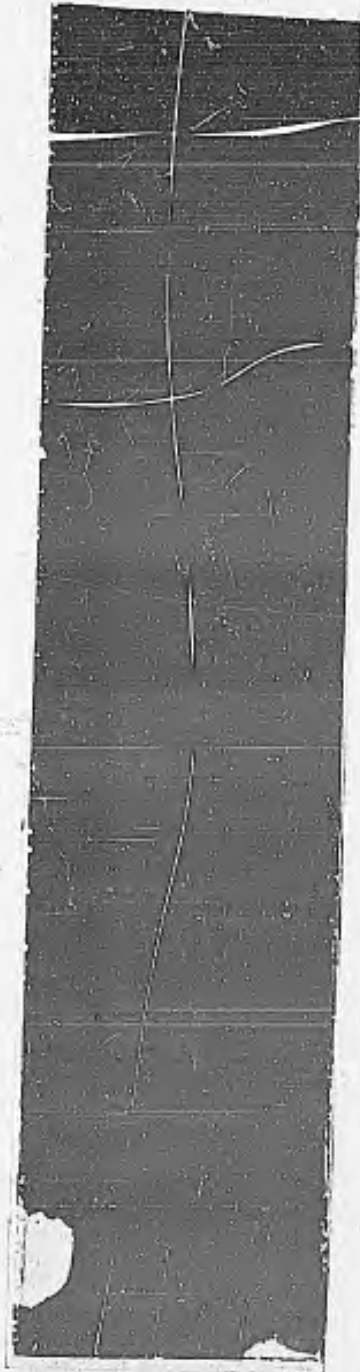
TRANSVERSE FRACTURES IN ANNEALED GLASS -- TYPE 4 FAILURE
